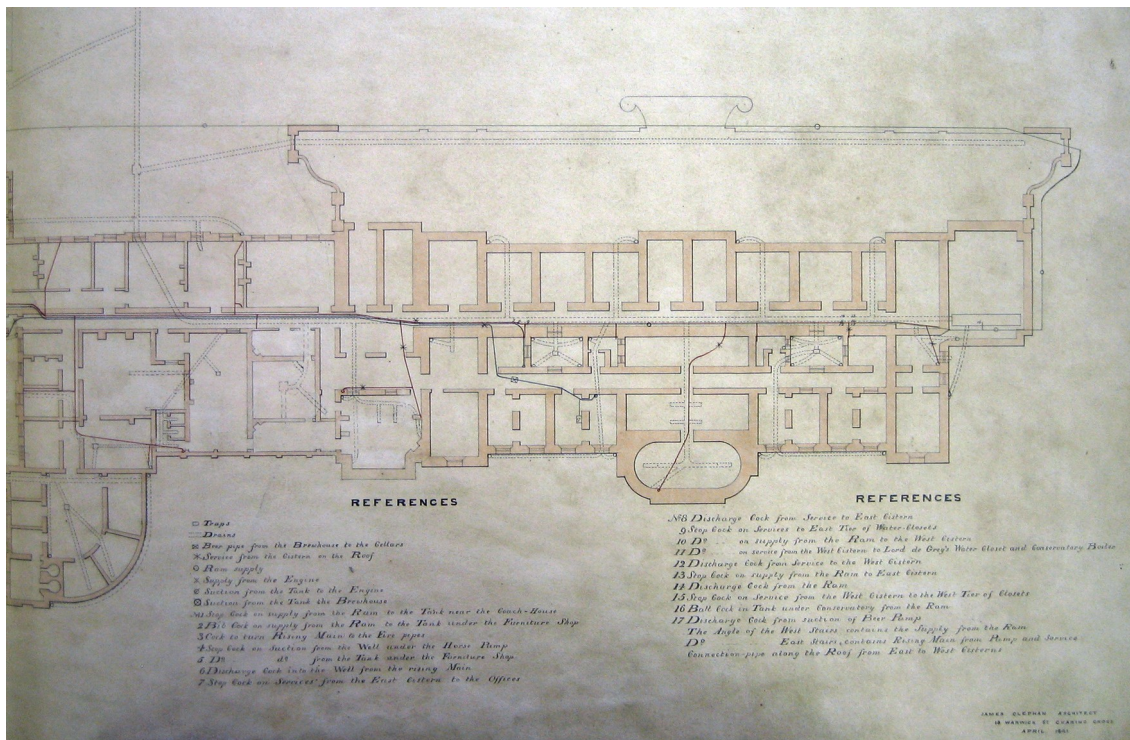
James Clephan's drainage plan. L33/162. BARS.
